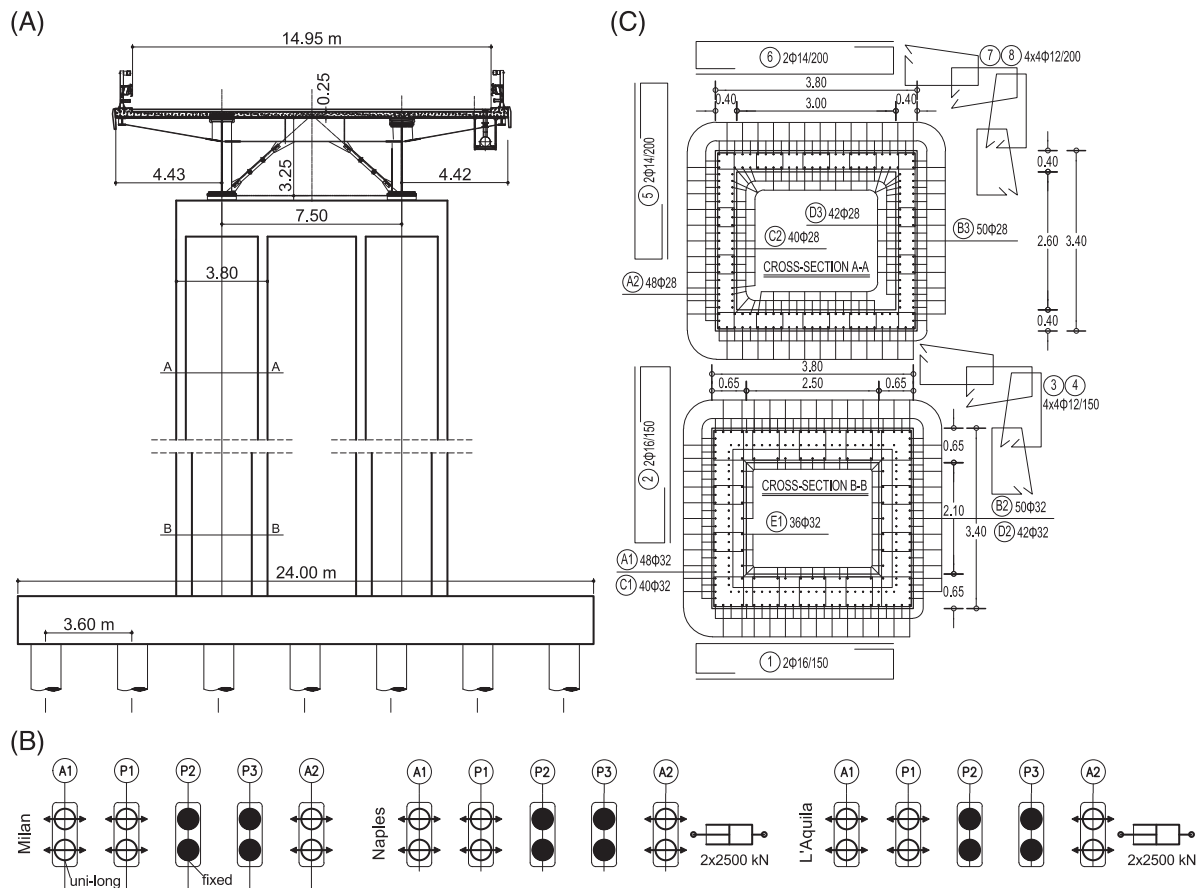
Tall viaduct: deck cross-section (A), bearings layout (B) and pier P2 cross-section with reinforcement for L'Aquila (C).
